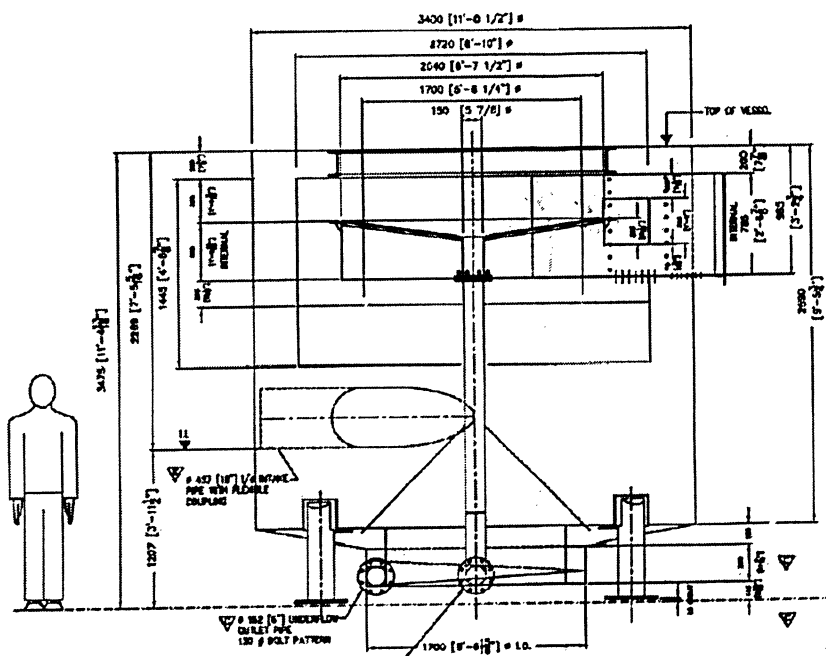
Elevation View of a 3.4 m Diameter Storm King Unit (Source: Li, 2004)
